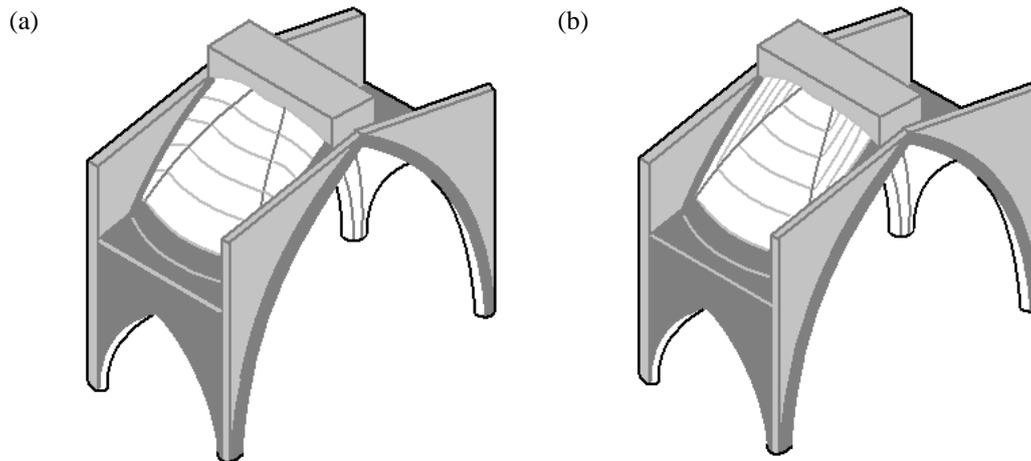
Main nave vault adopted division: Longitudinal vault sliced as longitudinal arches (a) and transversal arches (b).
